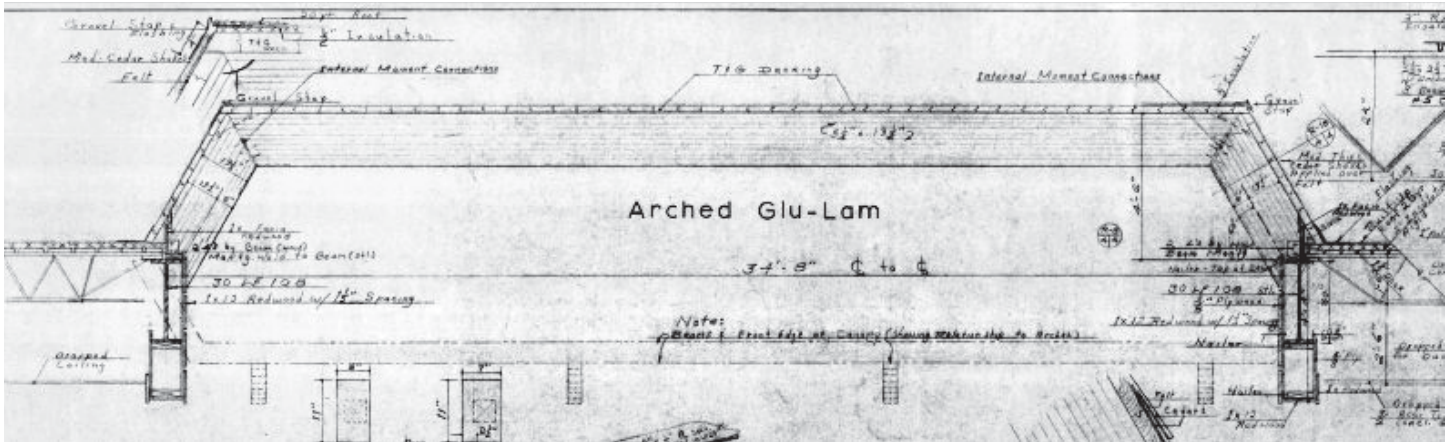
Profile of Glu-Lam beams, looking north (original plans)
